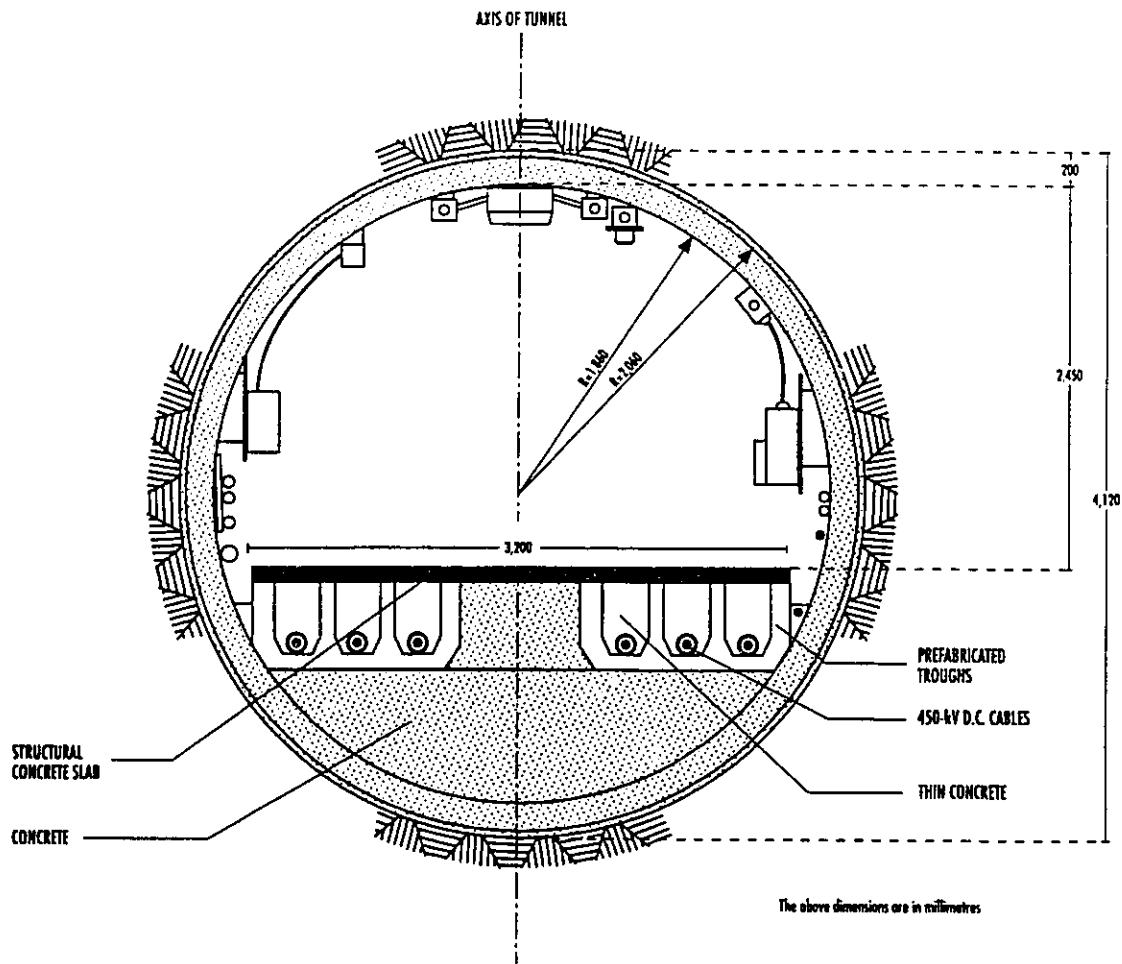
Cables under the floor of a tunnel (recent installation at Hydro-Québec)
